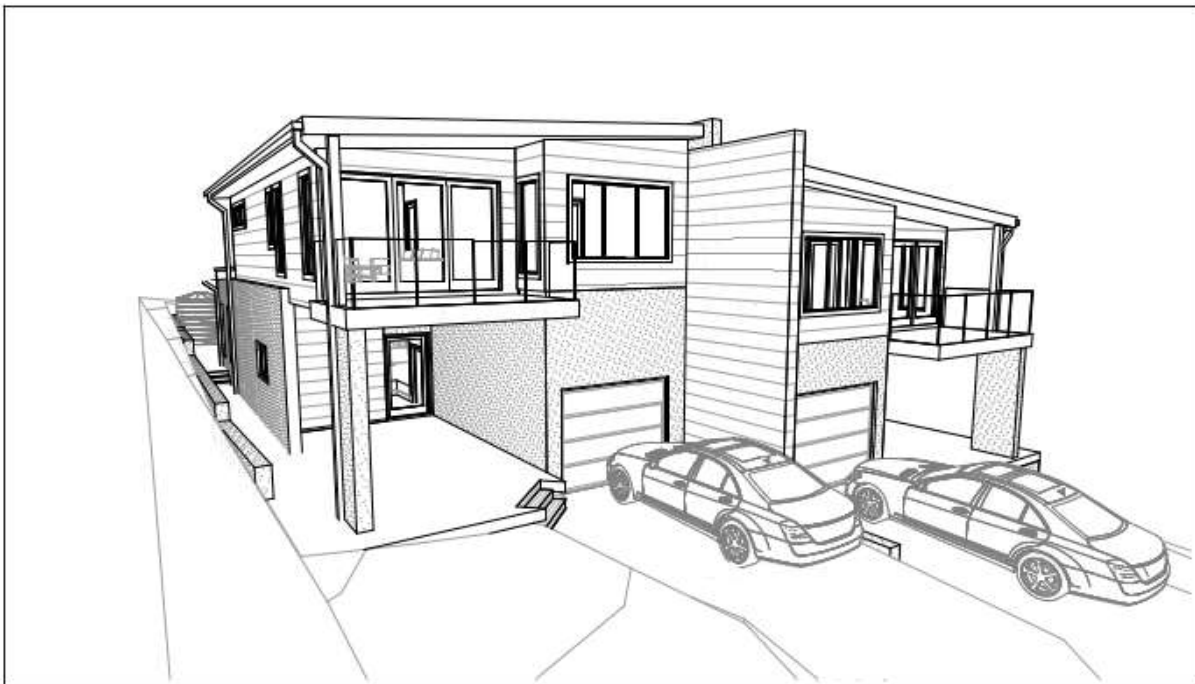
South-eastern 3D Elevation (streetscape Hanrahan Place)
